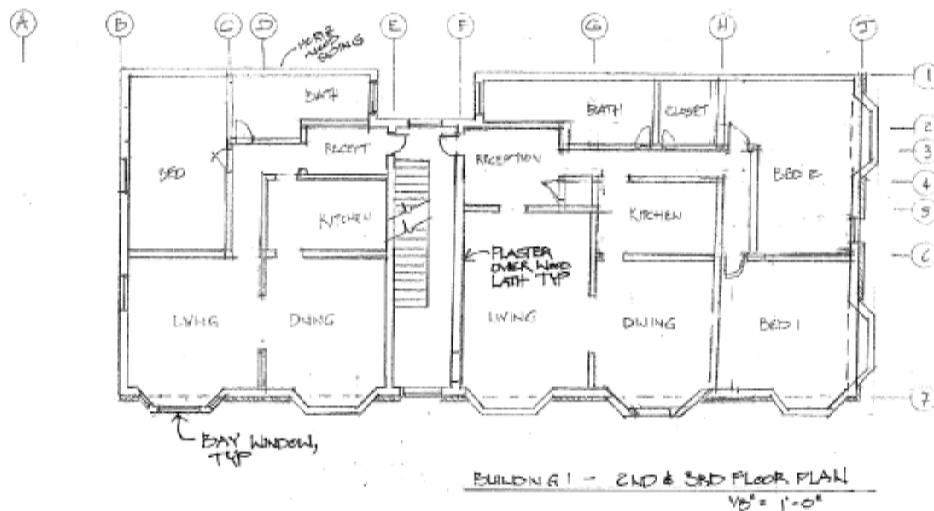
Second through Fourth Floor Plan. ATC 53-2A.
